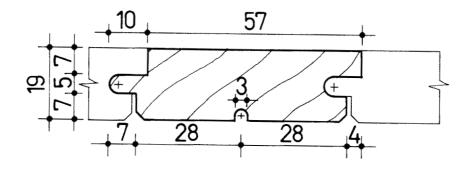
75 mm x 25 mm TONGUE AND GROOVE SECRET NAIL FLOORING (full size)
